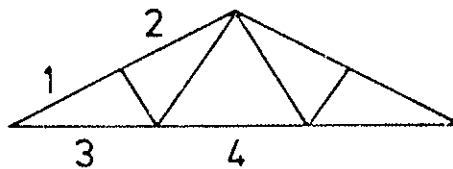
Moment coefficients for a roof slope of 1:3 and a span of 12.0 m, and loaded with a partial attic load.
